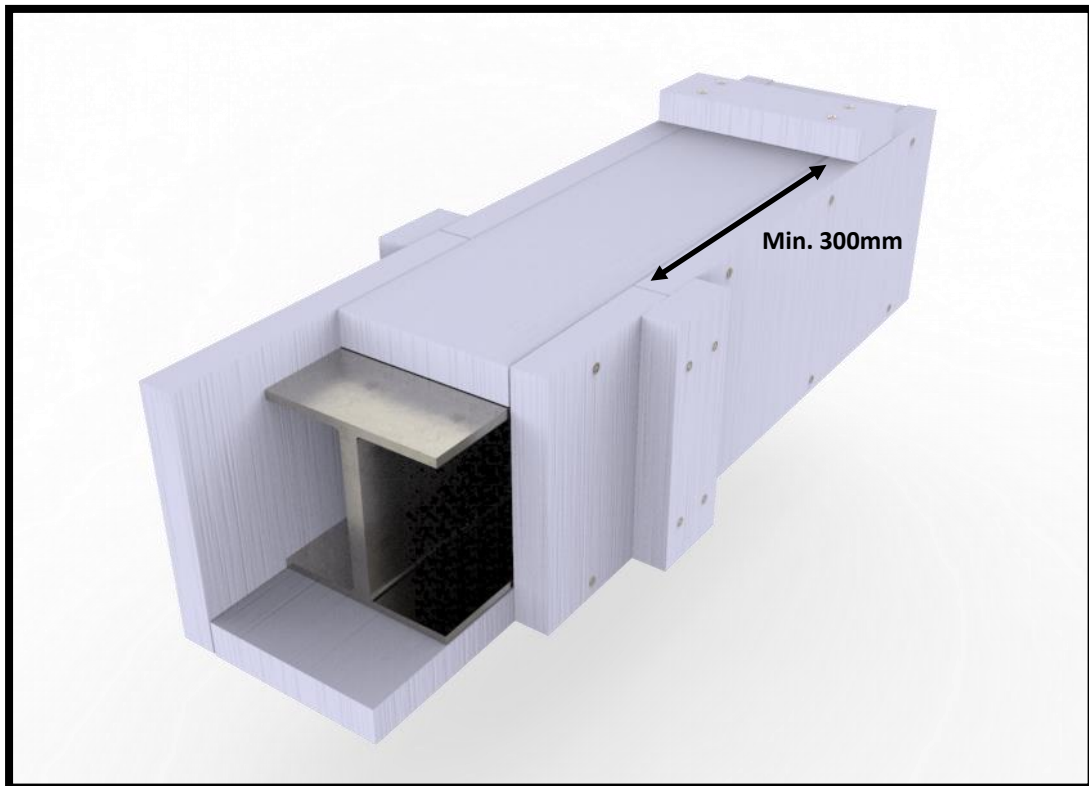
Beam Encasement Showing Cover strips and Board Joint Stagger
